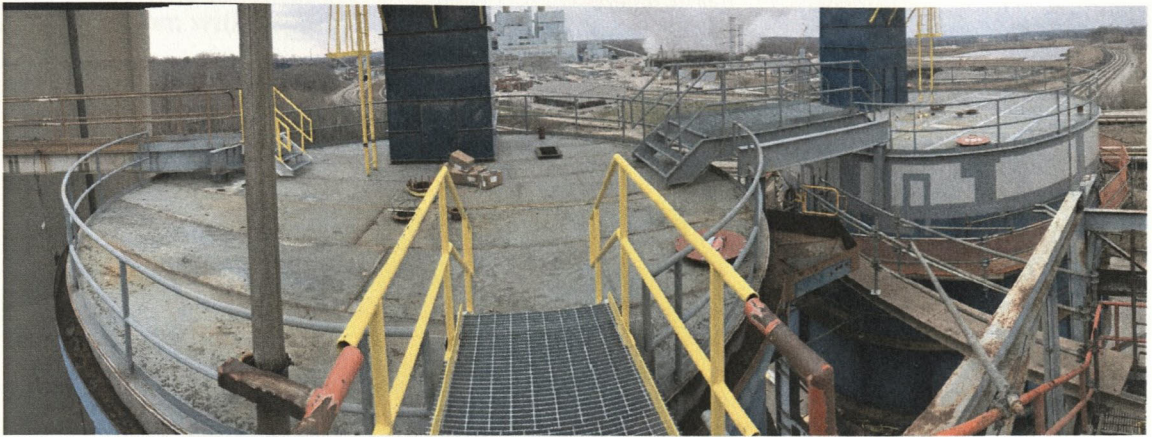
New Roofs and Accesses During Construction Atop Bins
